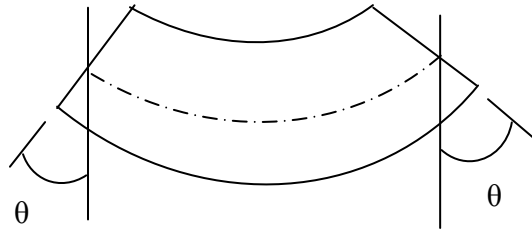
Rotational demand from increased camber in a precast, prestressed concrete girder
